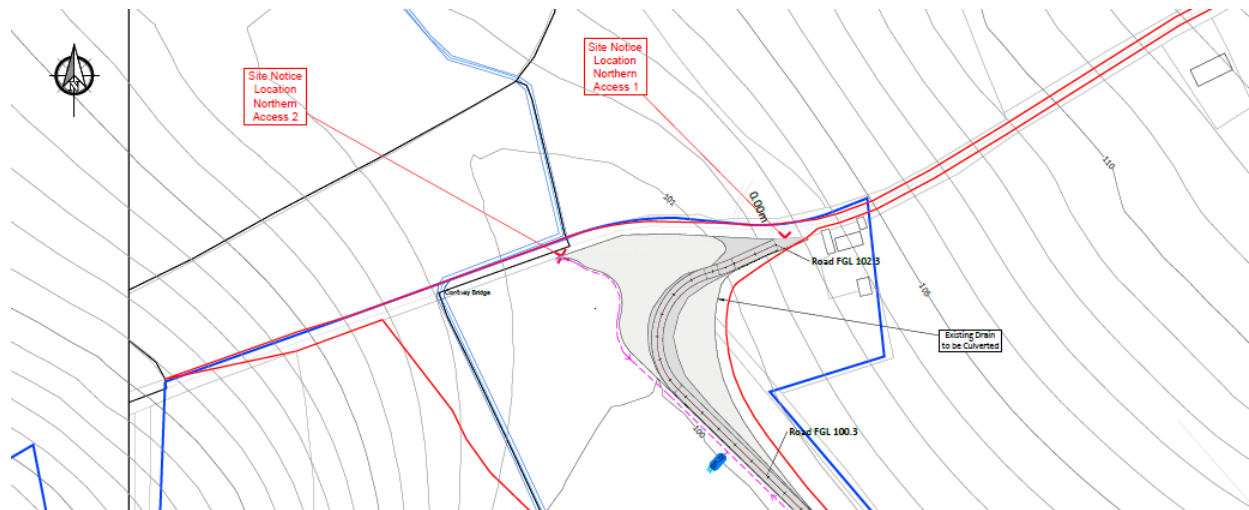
Excerpt of Drawing P2359-0100-0004 showing proposed access and access and existing agricultural access to be closed.
